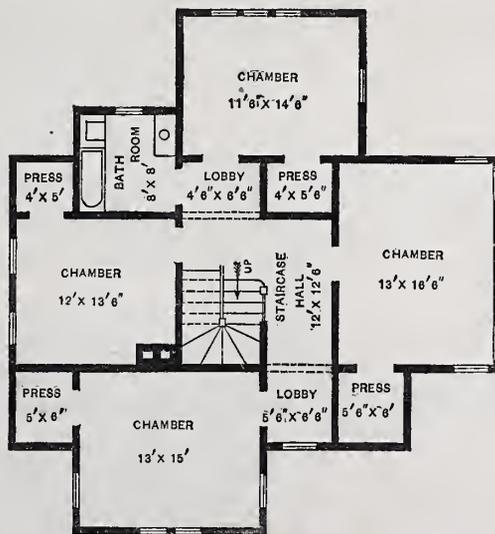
Second Floor Plan.—Scale, 1-16 Inch to the Foot.
